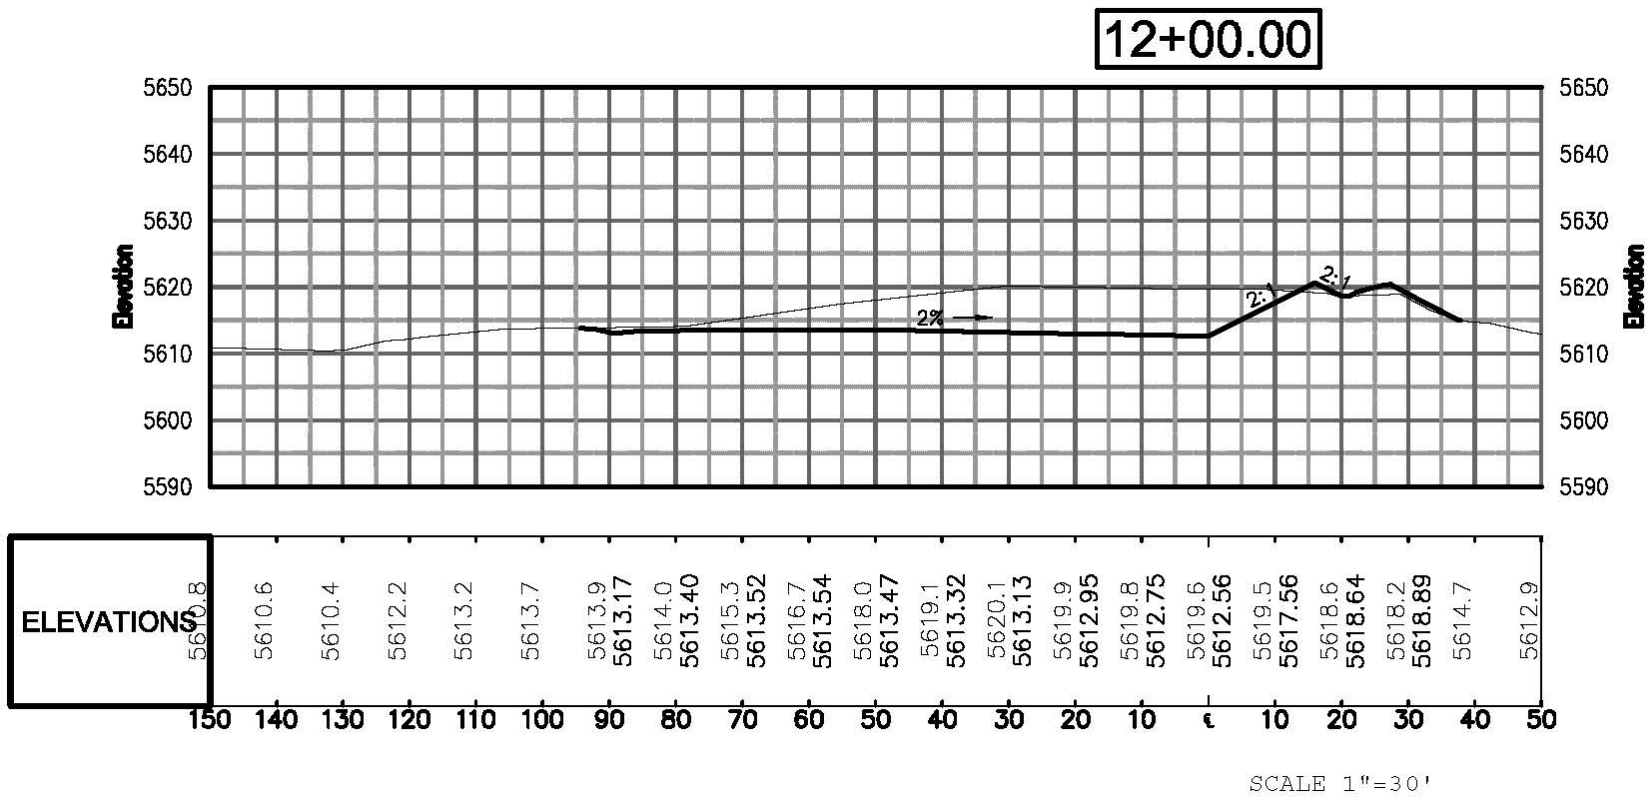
Cross-section of elevations pre-construction (light grey) and post-construction (black) at Station 12+00
